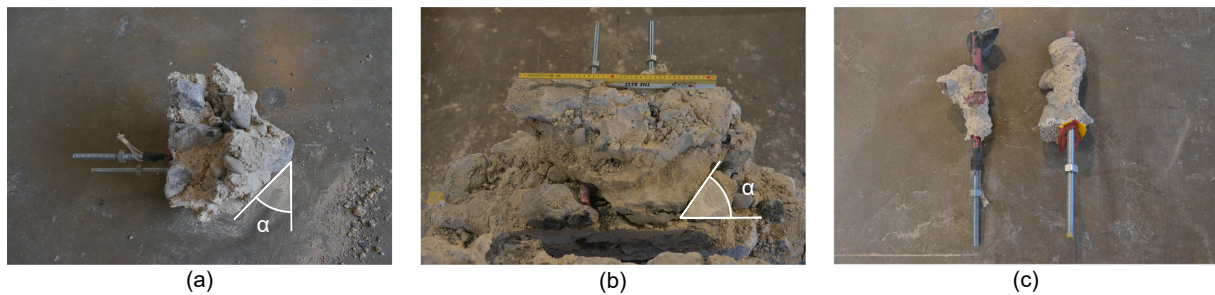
Damage observed for PA4 specimen after demolition: (a) lateral view of the masonry breakout block; (b) top view of the masonry breakout failure; (c) state of the anchors.
